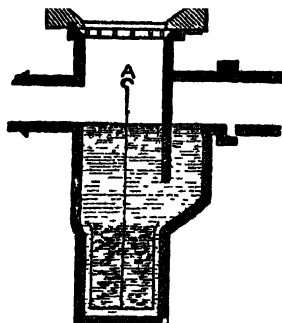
Dean's gully-trap. A, handle of movable bucket.
